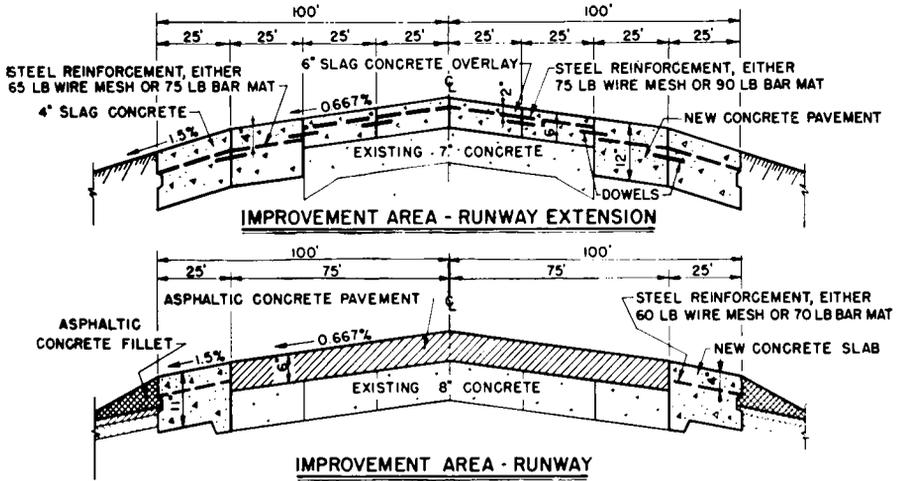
Pavement sections through resurfacing and widening of existing NE-SW runway.
